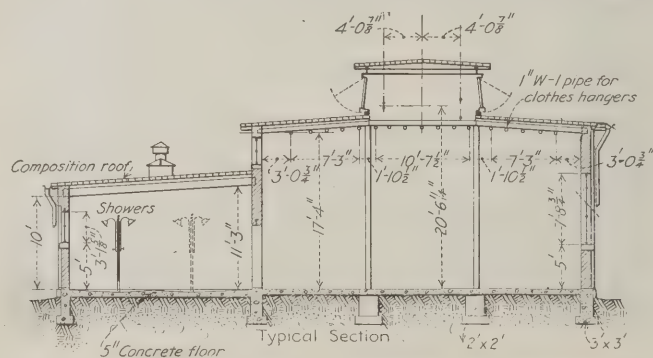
CROSS-SECTIONAL ELEVATION OF BATHHOUSE
